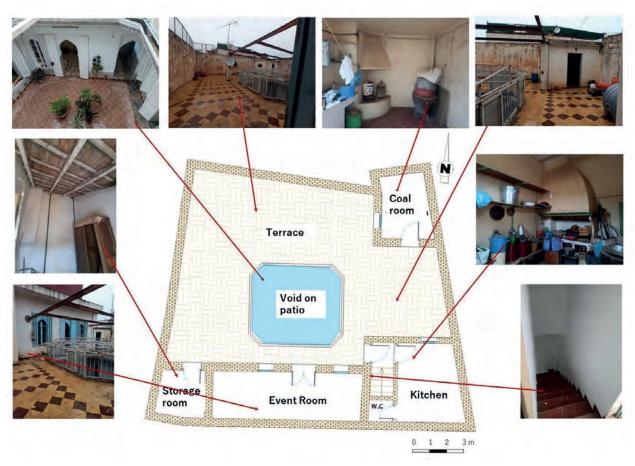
first floor of house N° 03 - Dar Nebia in Bab El Hadid. (source: the authors).
